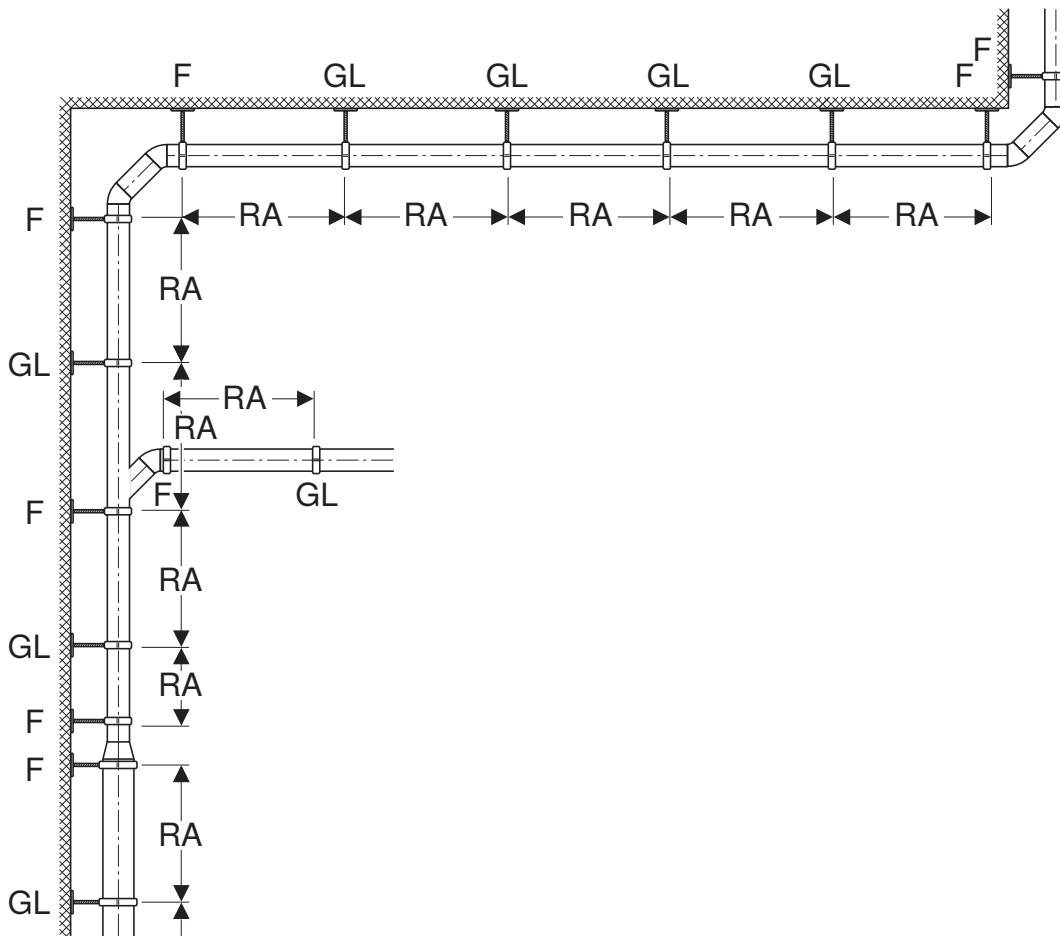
Pipe bracket spacing RA in a rigid installation without support shells
